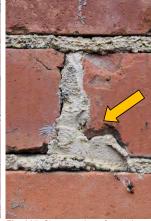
Close-up view of typical bedding mortar which has not been struck for a fair-faced pointing finish and the use of poor-quality bricks.
